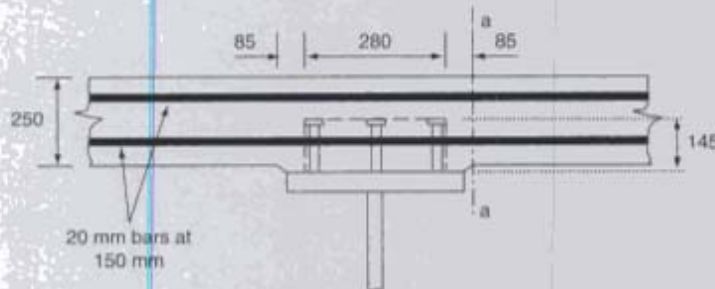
Shear studs and transverse reinforcement at mid-span and adjacent to an end support
